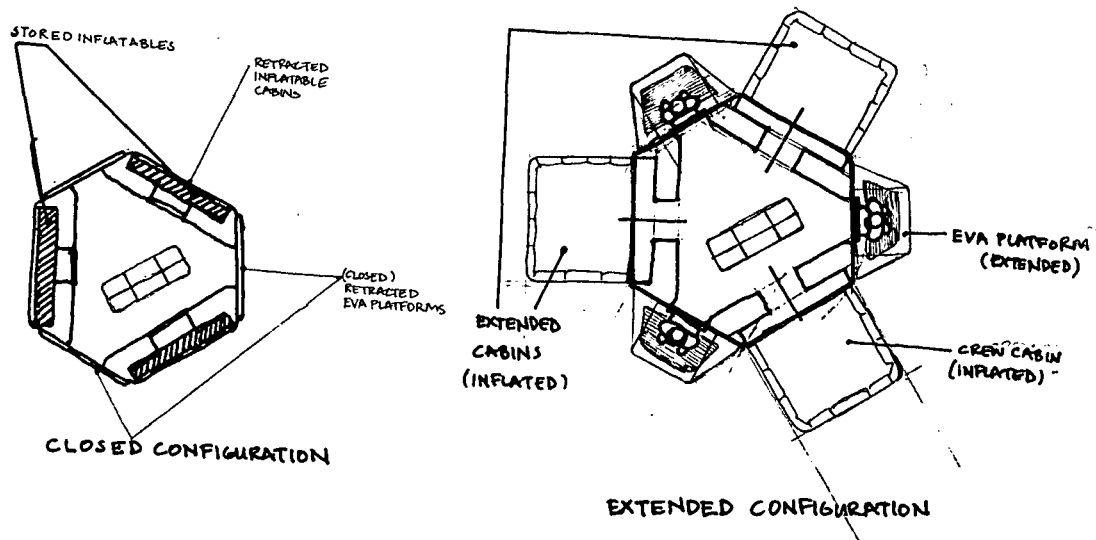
2: plans - left: closed configuration, right: extended
